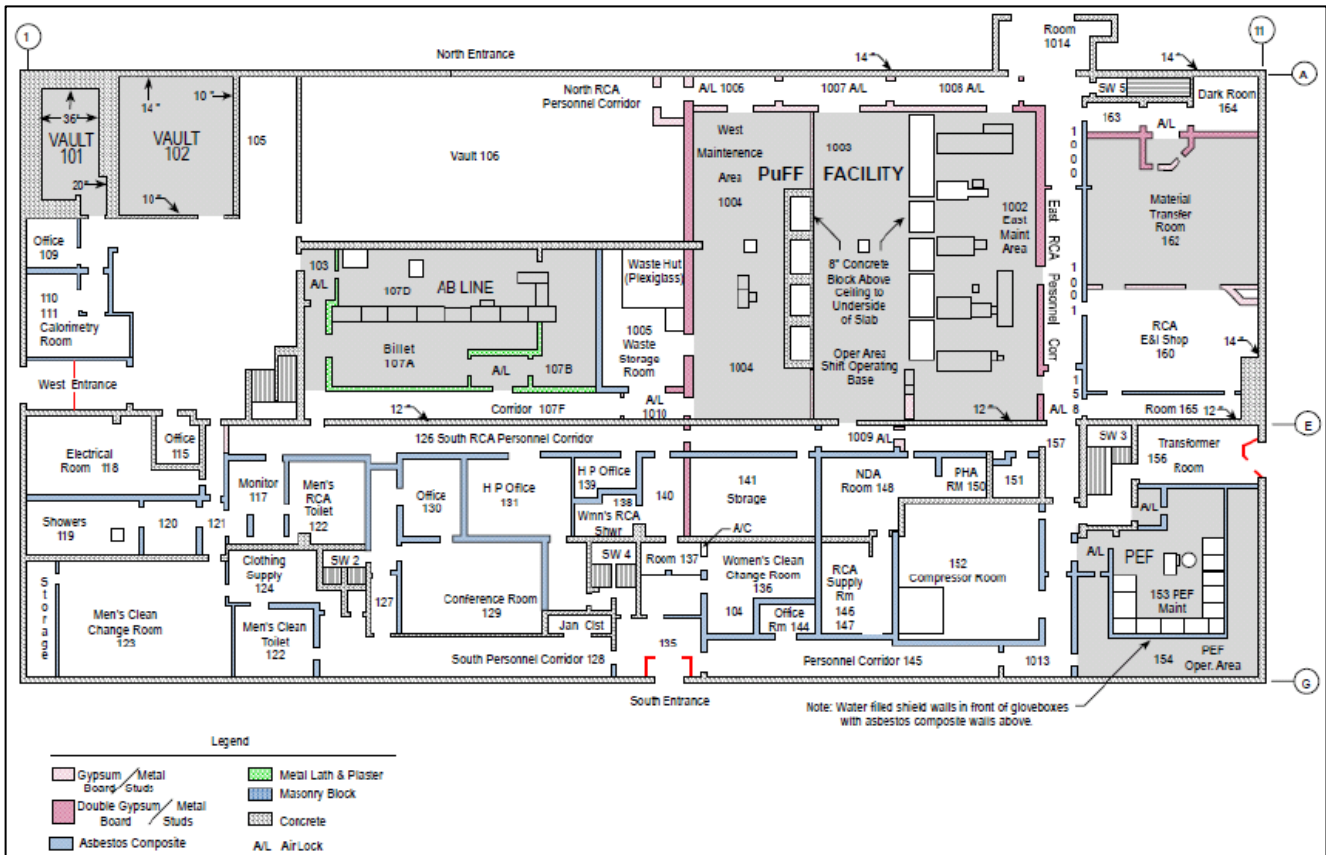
Building 235-F First Floor Plan (Taylor and Phifer 2012, p. 55).
